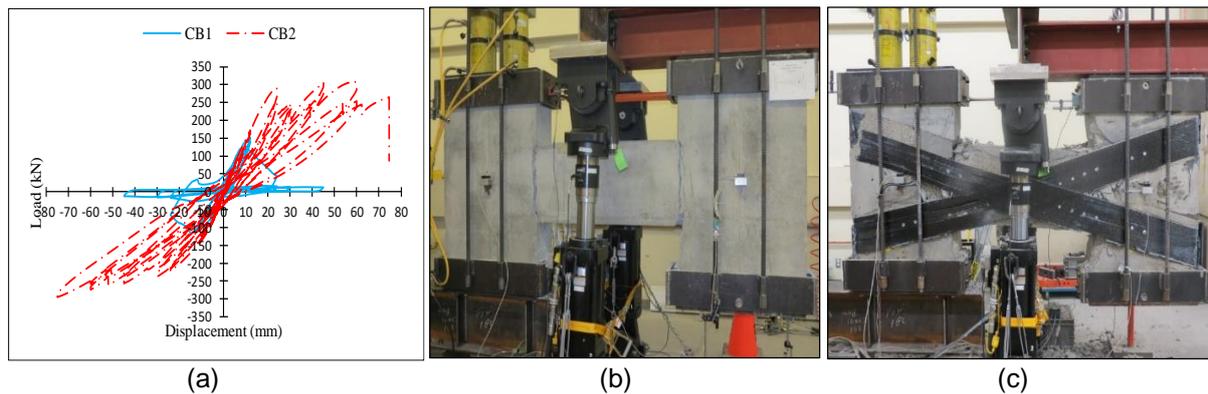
a) Hysteretic behavior b) Specimen CB1 at failure, c) Specimen CB2 at failure
